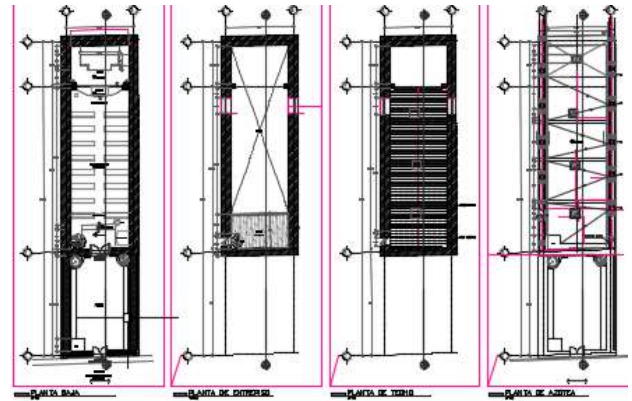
Architectural and typological plan of a religious building as part of the technical data sheet concentrating on construction systems and materials used in religious buildings
